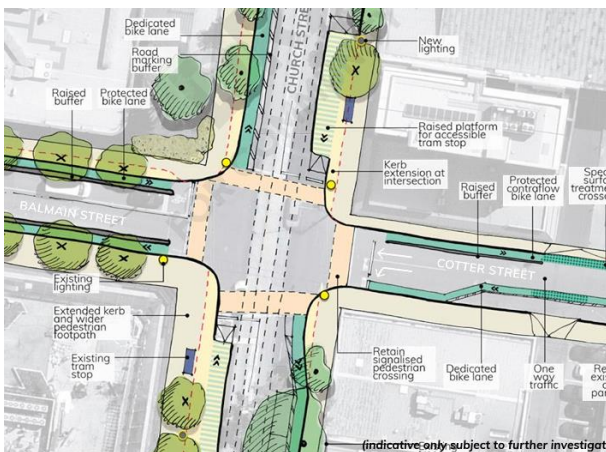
Hotspot 4 - Balmain Street, west of the underpass
